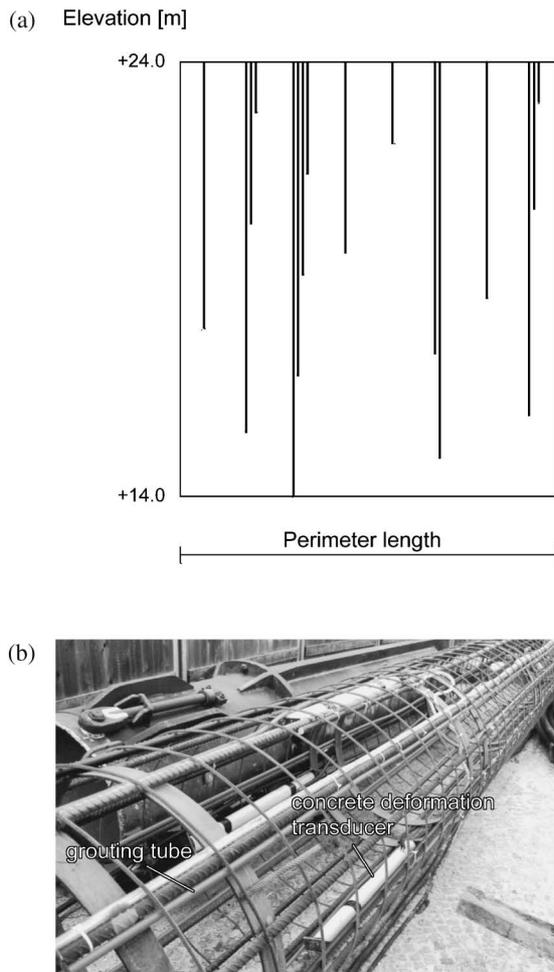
(a) Developed view of reinforcement cage ($8\phi 25$ mm) in the pressure-grouted portion of pile no. 1 with arrangement of grouting tubes; (b) instrumented pile with concrete deformation transducers and grouting tubes
